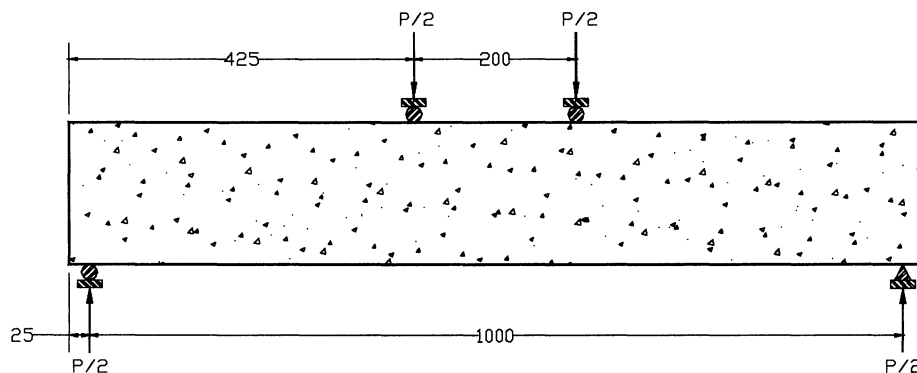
Illustration showing placement of loads for beam test (dimensions are in mm).
